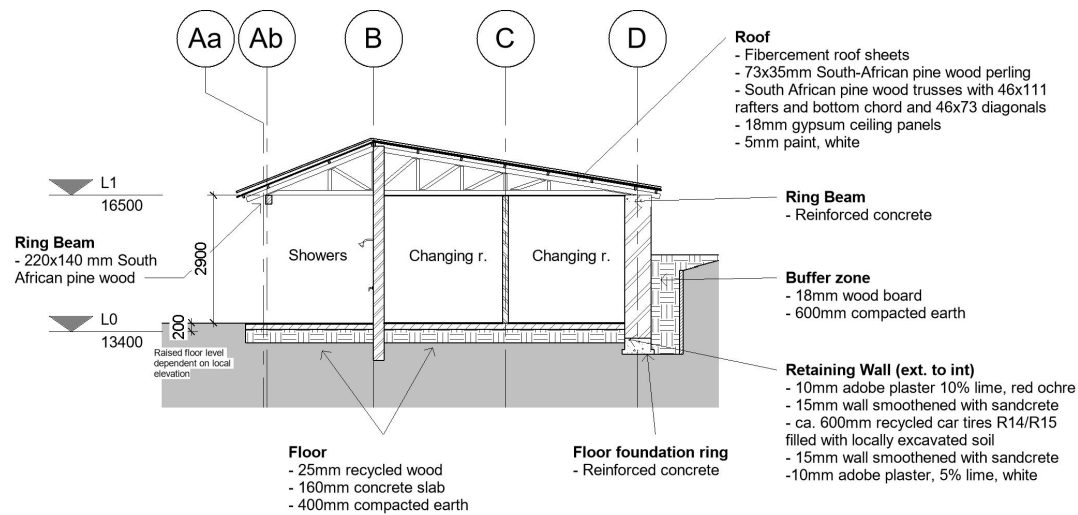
Building section: changing rooms and showers, original file scale 1:100
